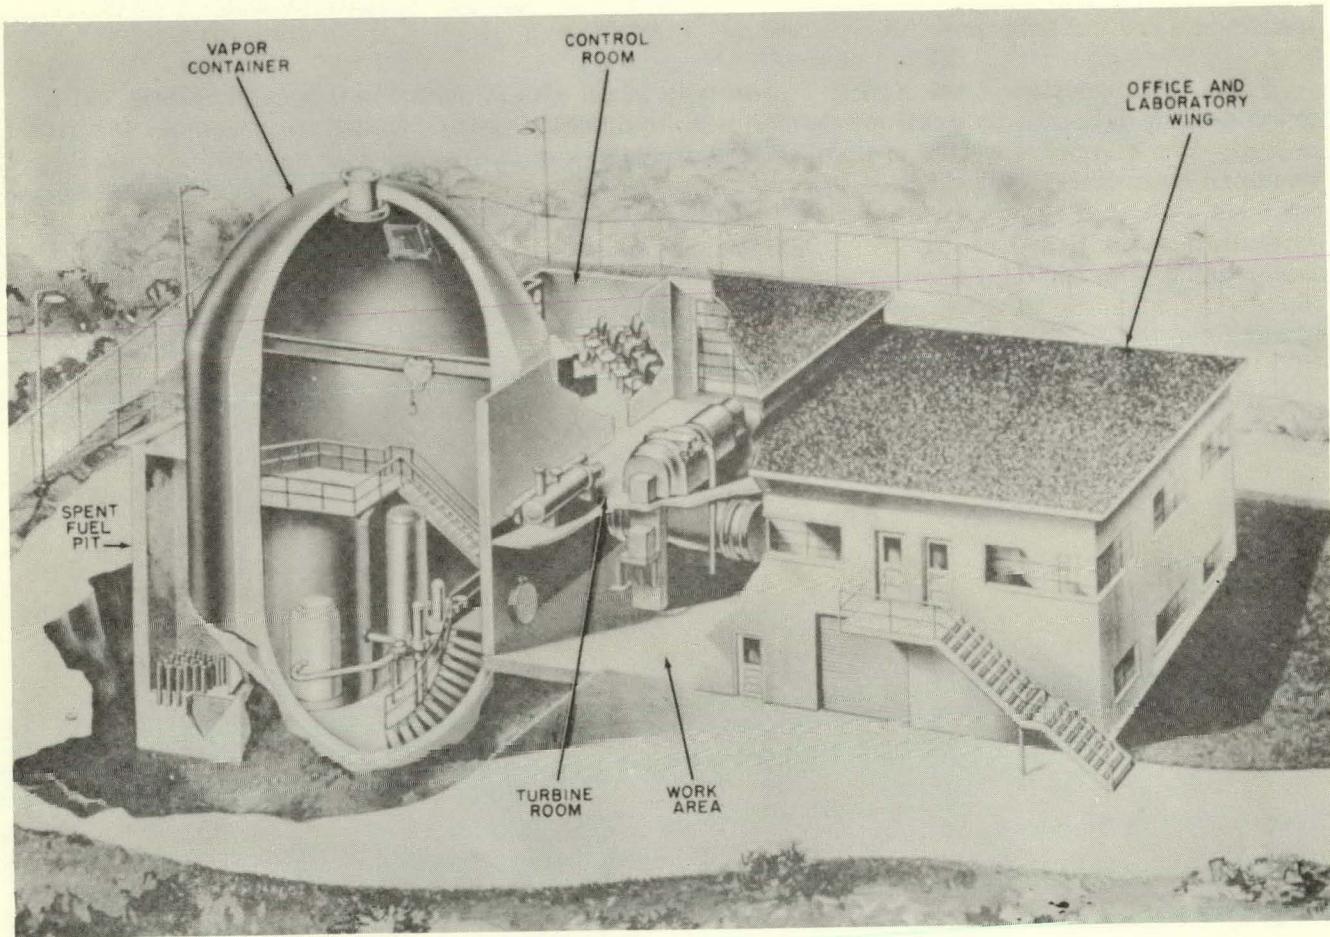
Army Package Power Reactor, APPR-1, Cutaway View
